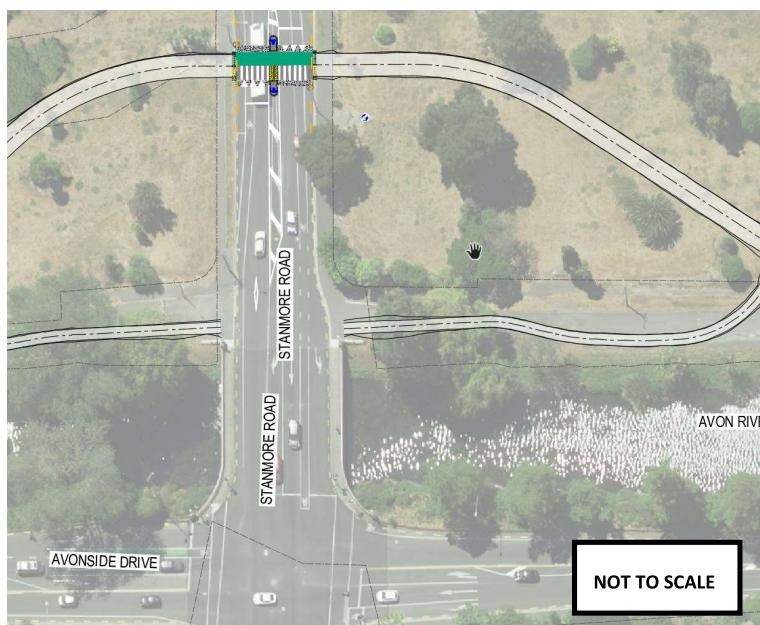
Approximate location to Stanmore Road/ Avonside Drive intersection.
